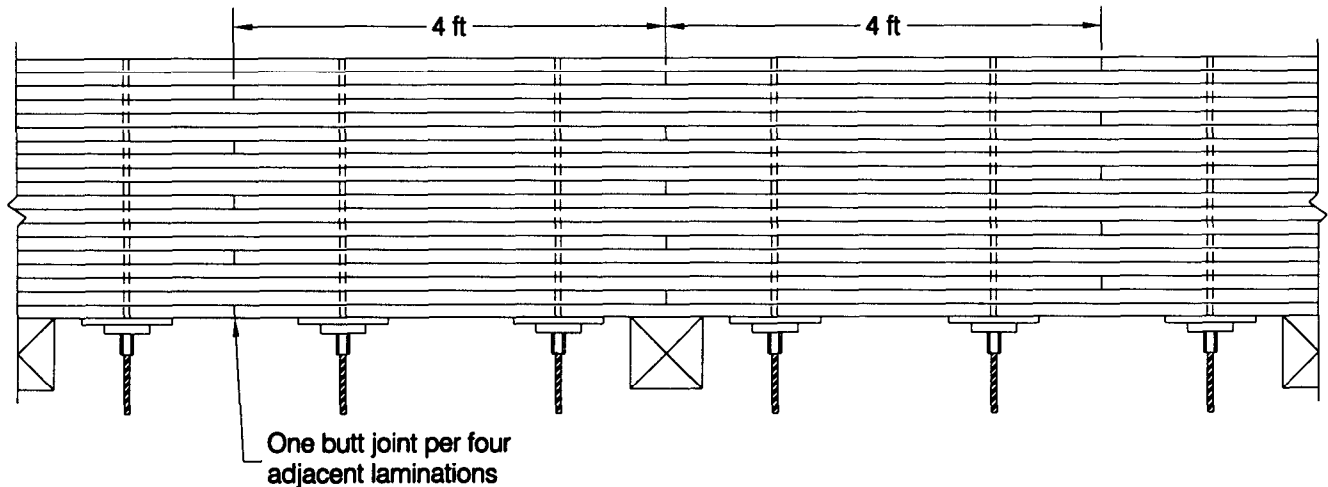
Butt joint configuration used for the Cooper Creek bridge. A butt joint was placed transverse to the bridge span in every fourth lamination. Longitudinally, butt joints in adjacent laminations were separated by 4 ft.
